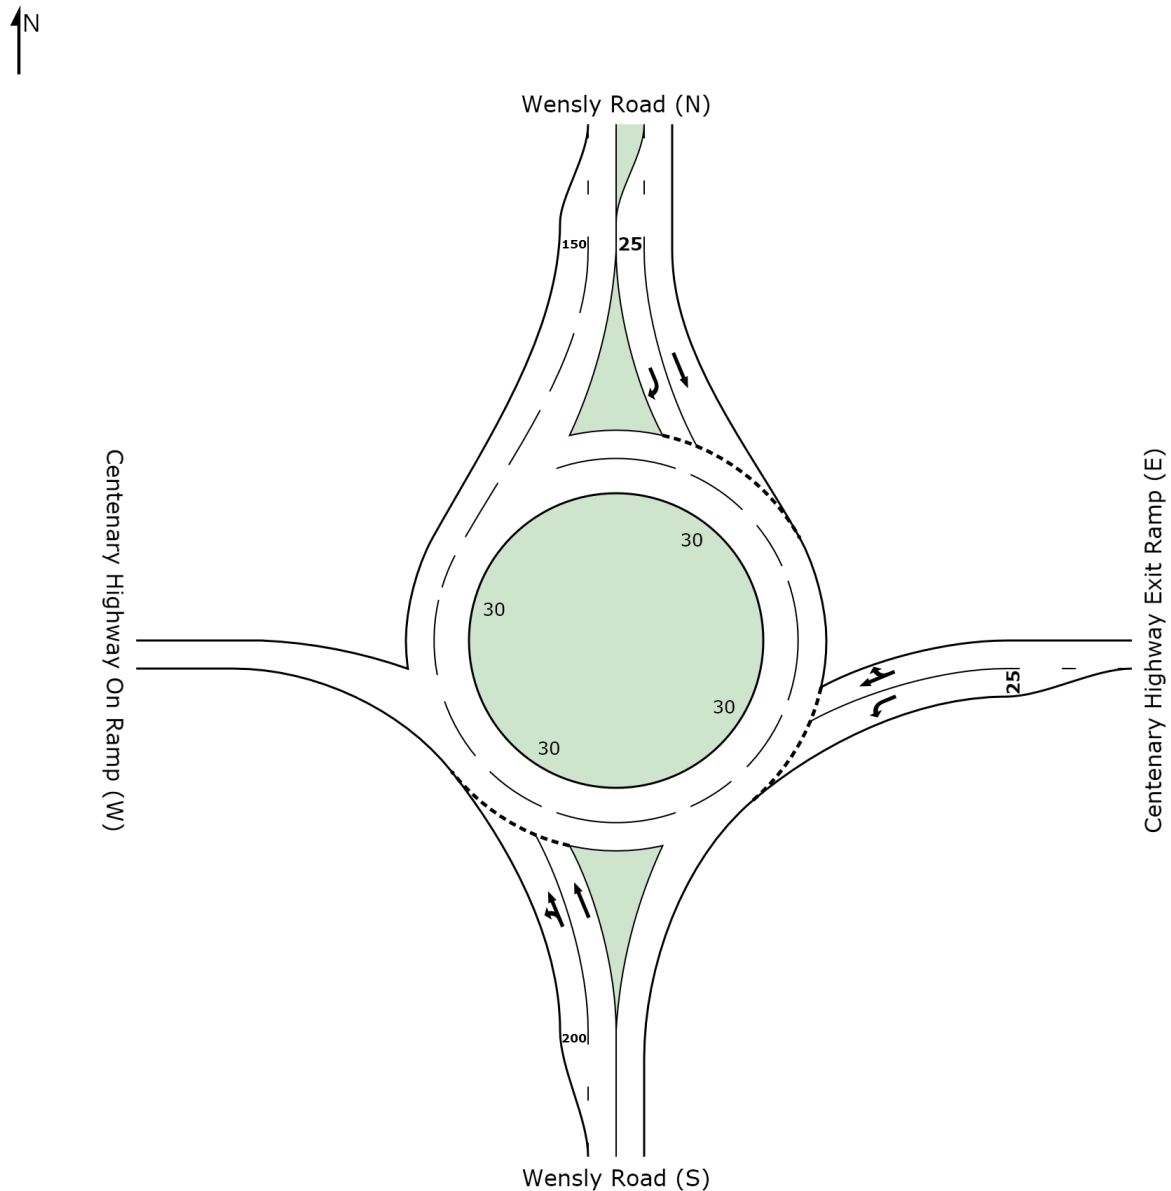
Wensley Road Interchange – Southern Intersection Roundabout Layout
